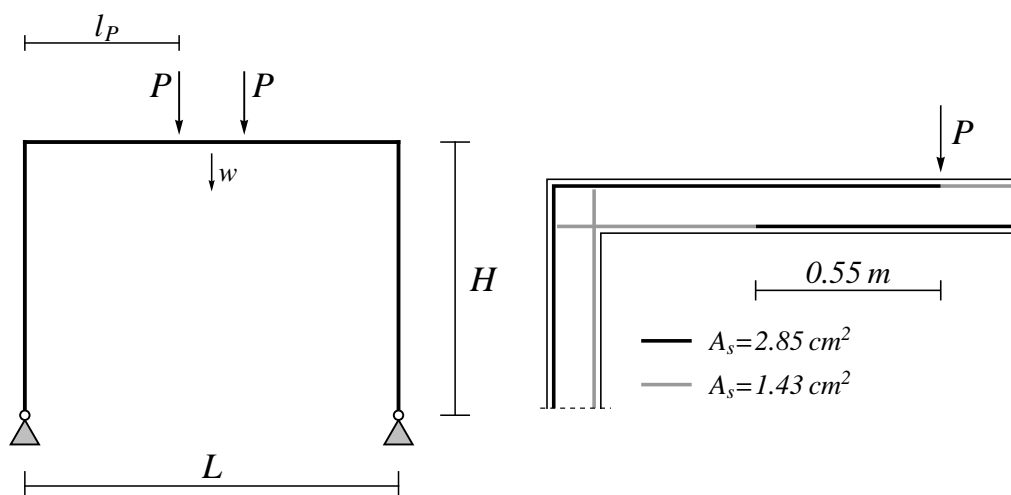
Pinned portal frame: geometry, loading pattern and reinforcement.
